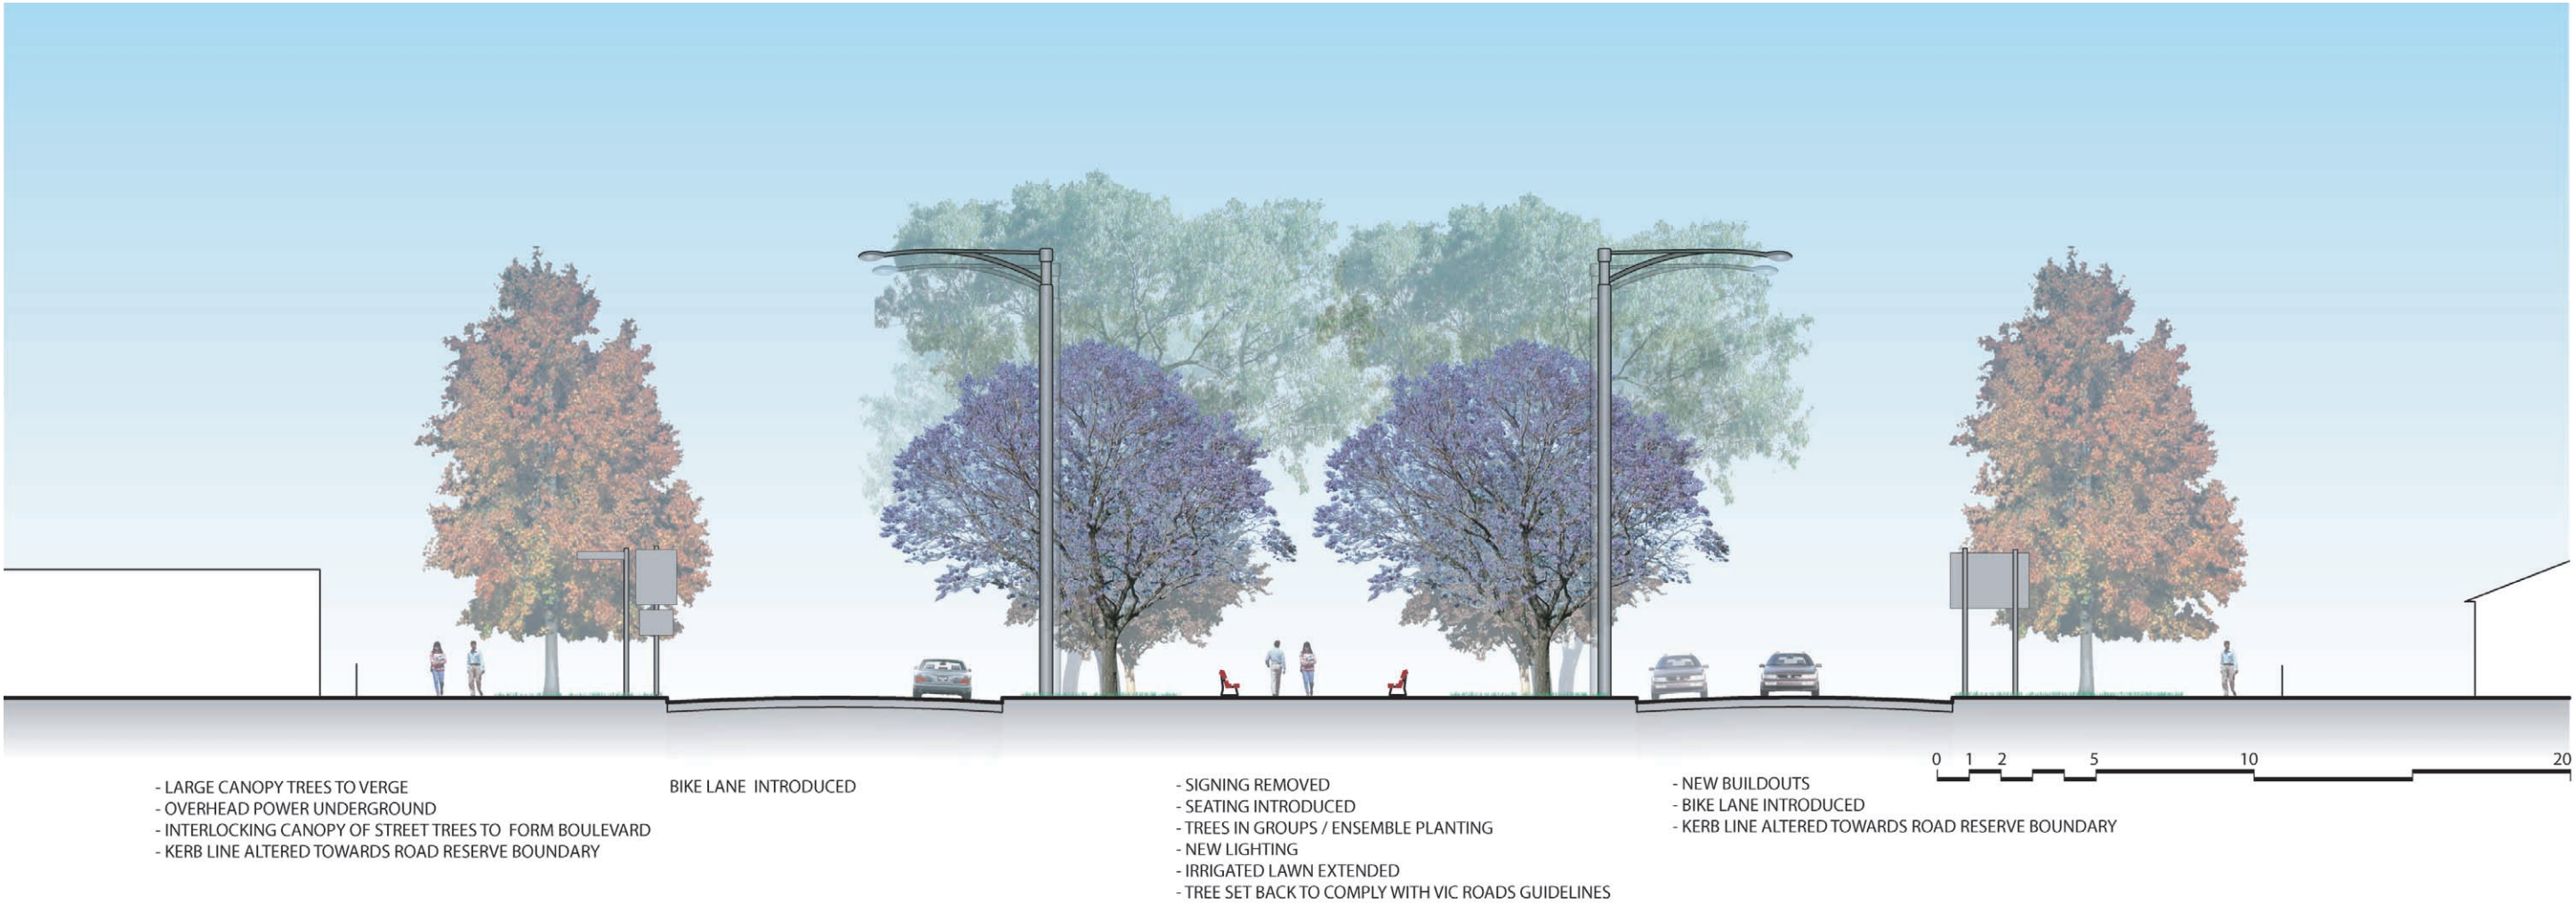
Section BB Residential Zone - Proposed Long Term Vision
